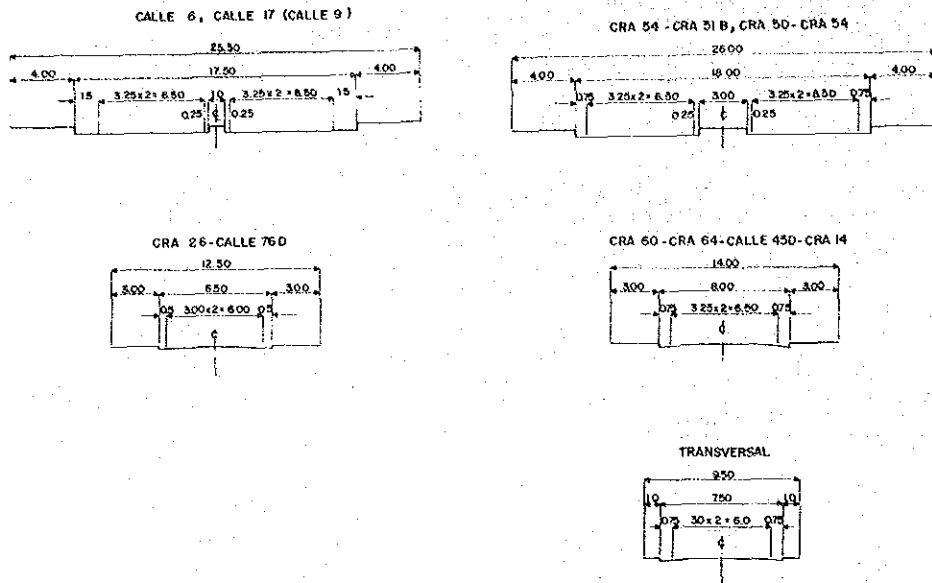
(1) Cross Section for the Streets Plan in Barranquilla
